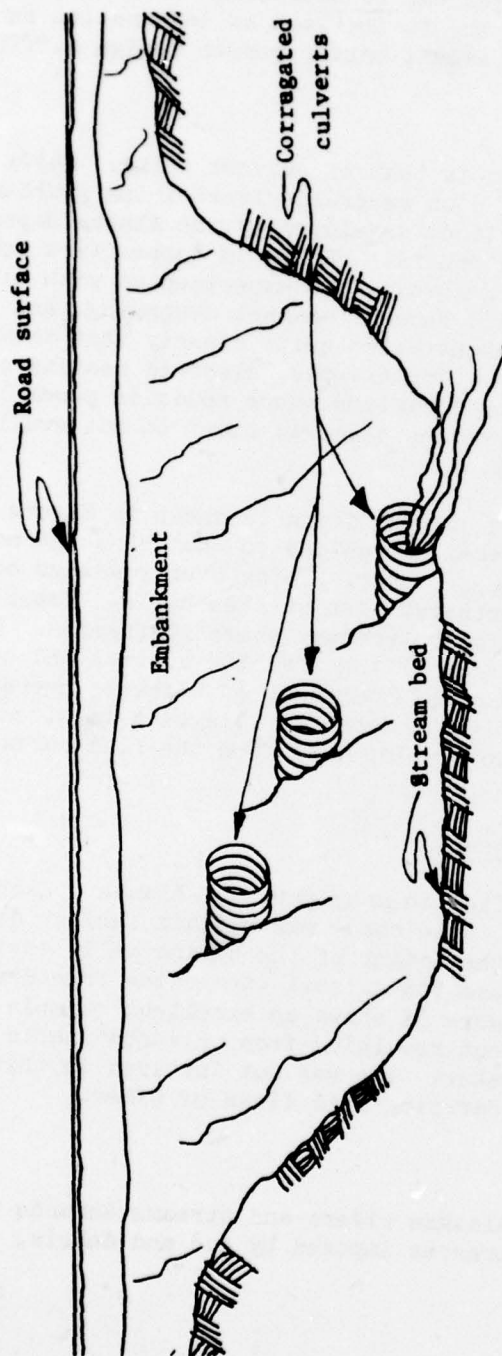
Schematic cross section of culverts at different elevations, used on Elliott and Richardson Highways.
